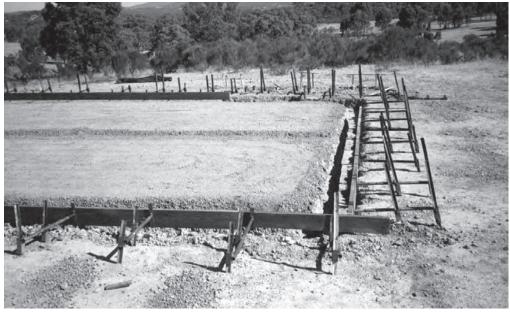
Compacted crushed rock and formwork for a concrete slab
